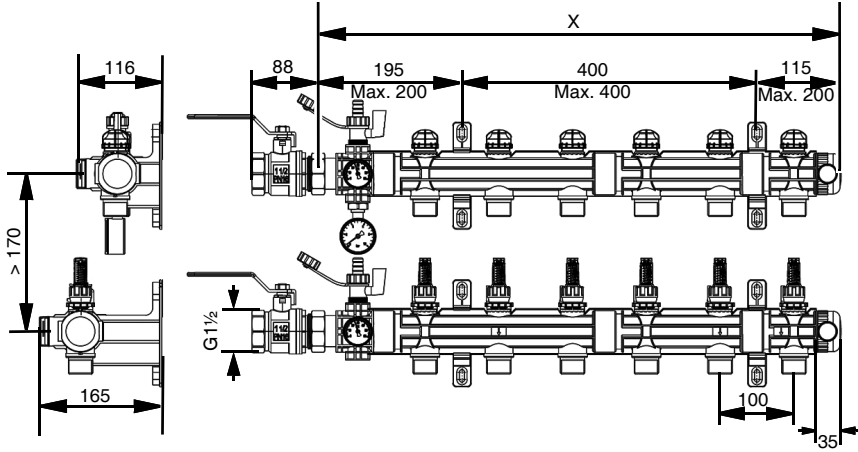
Dimensions in mm ProCalida® IN G1½ with the universal base package (with multi-way union) and ball valve kit
